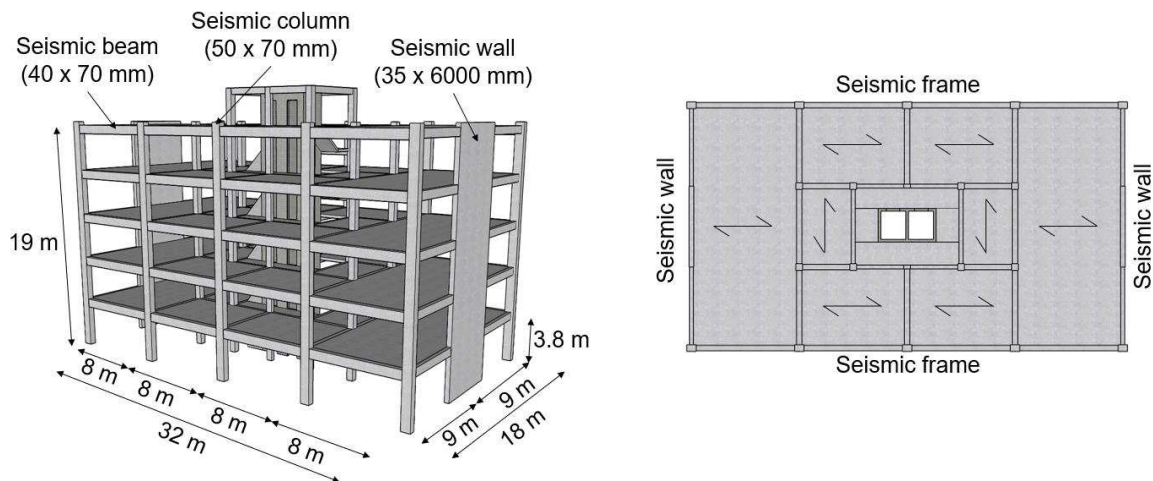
Dimensions and plan view of the structural system (Bianchi et al. 2018).
